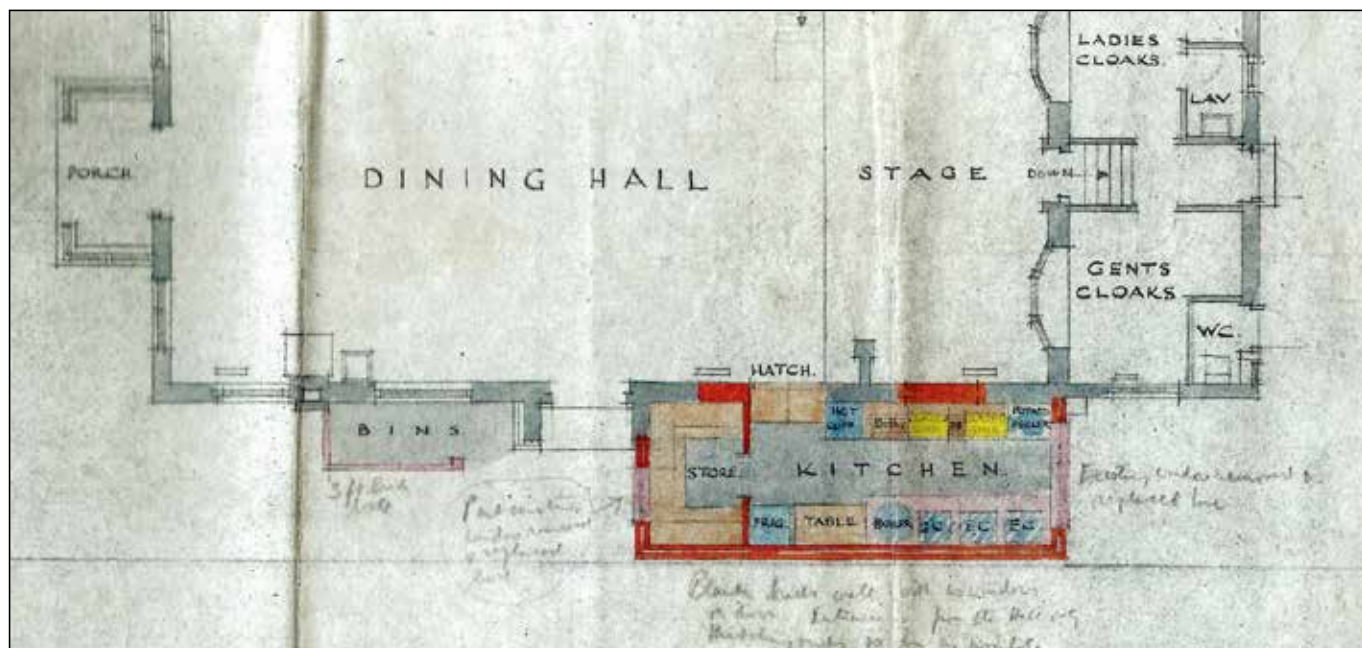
Detail from the 1935 plan of SCC kitchen
